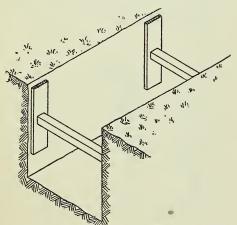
Single Poling Boards and Struts in Firm Ground.
